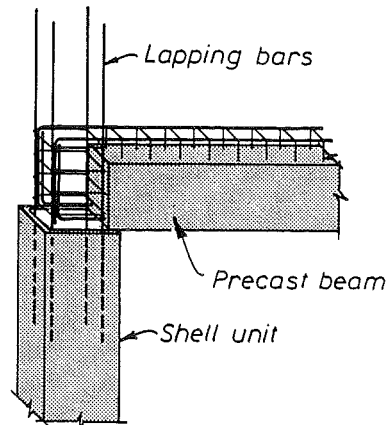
Typical Precast Concrete System Used in Portugal and Tested by Santos (1987).
